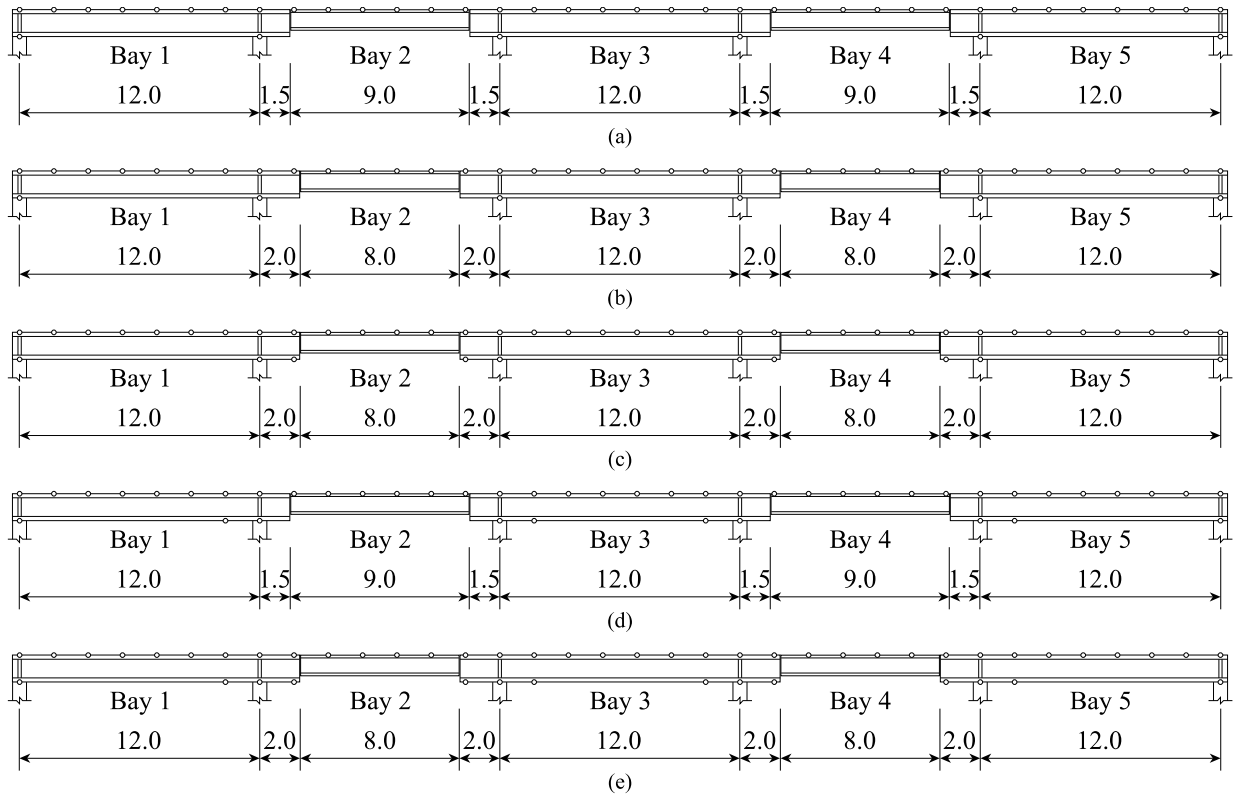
Roof-framing configurations used in the design examples (dimensions in m), corresponding to: (a) LRC 1; (b) LRC 2; (c) LRC 3; (d) LRC 4; and (e) LRC 5.
